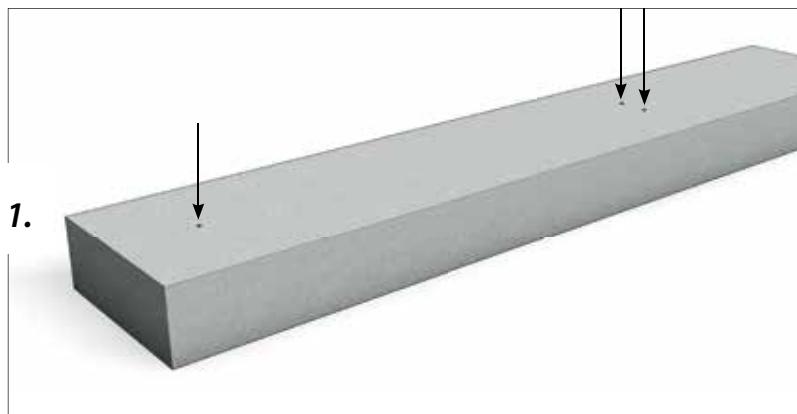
1 (pre-drilling the concrete foundation)
